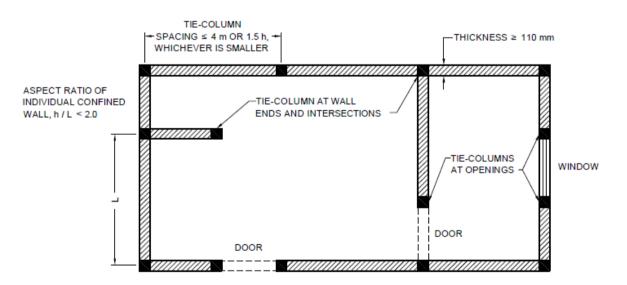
TYPICAL PLAN ILLUSTRATING THE PLACEMENT OF RC TIE COLUMNS
